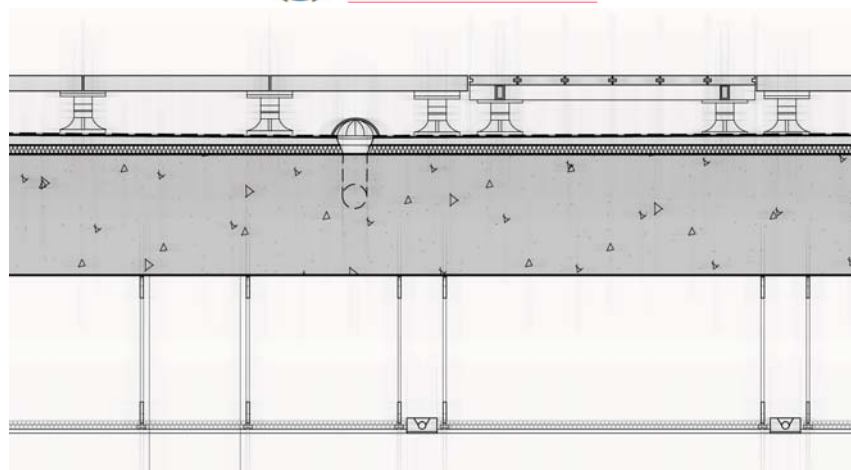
Roof construction. Scale 1:25 (Author, 2011).
